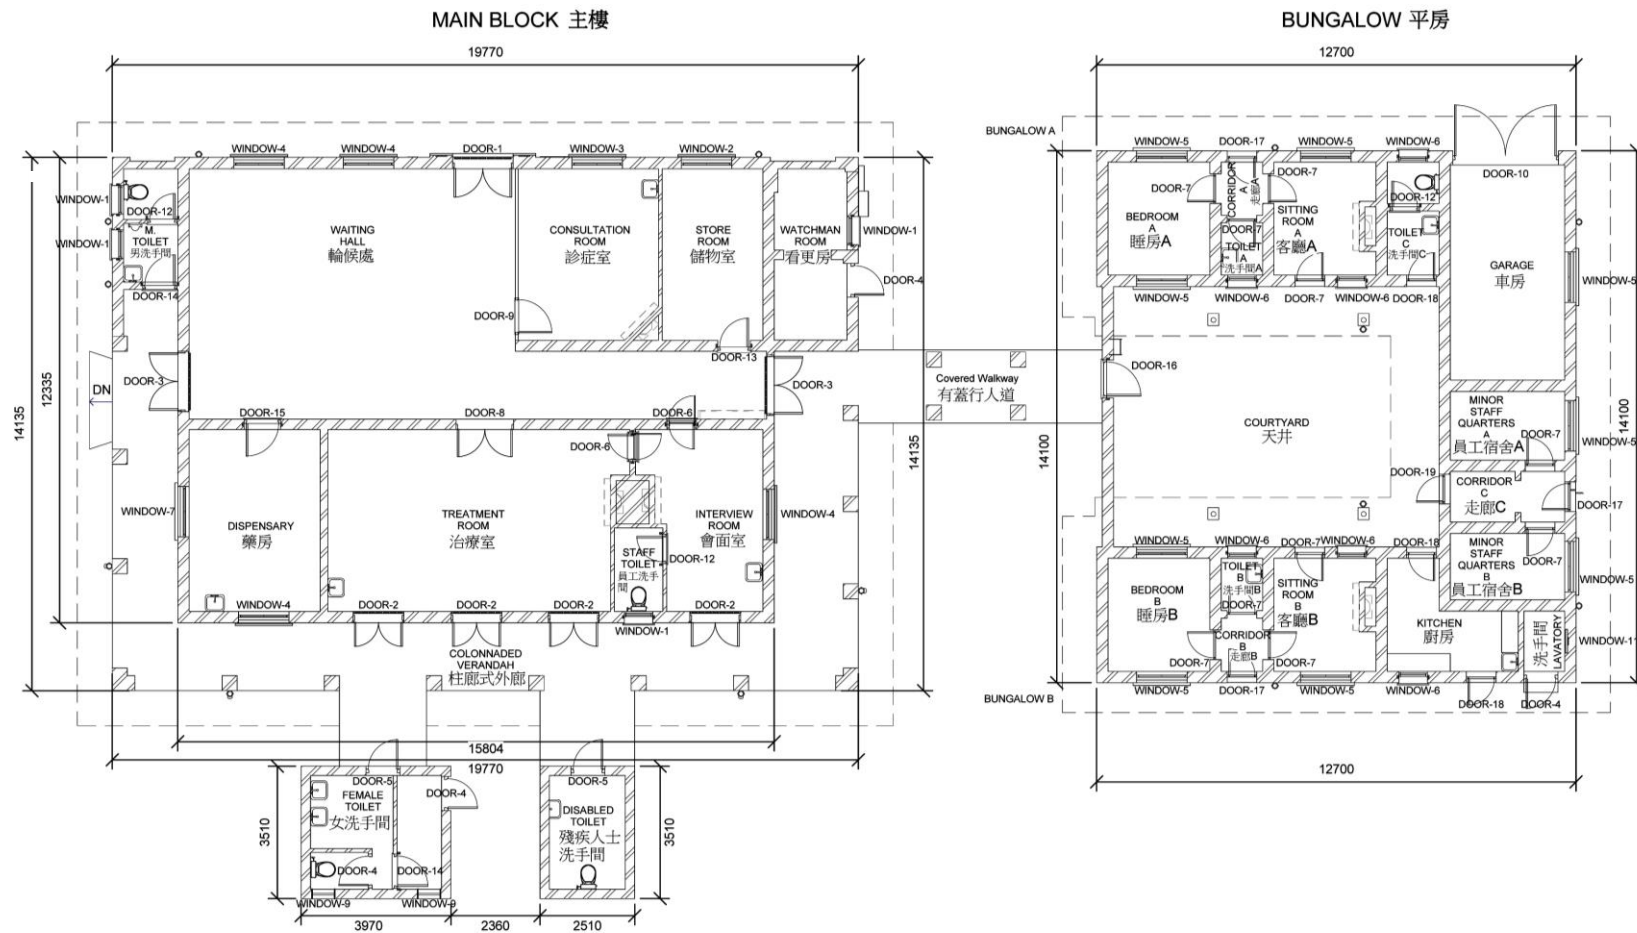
Existing layout plan of the LHTWC (Edited by Hannah Liu)
